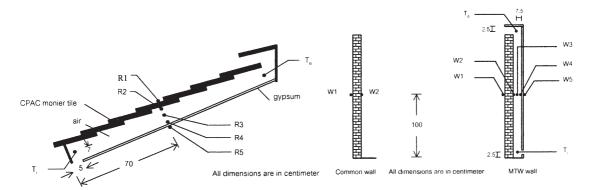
Position of thermocouples setting in roof and walls (not to scale).
